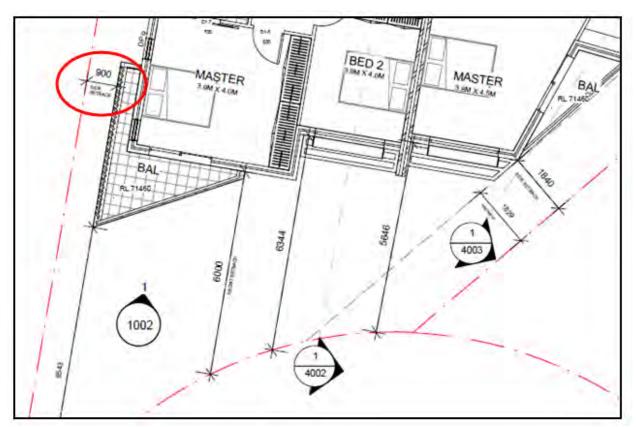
Dwelling 1 first floor balcony side setback encroachment
